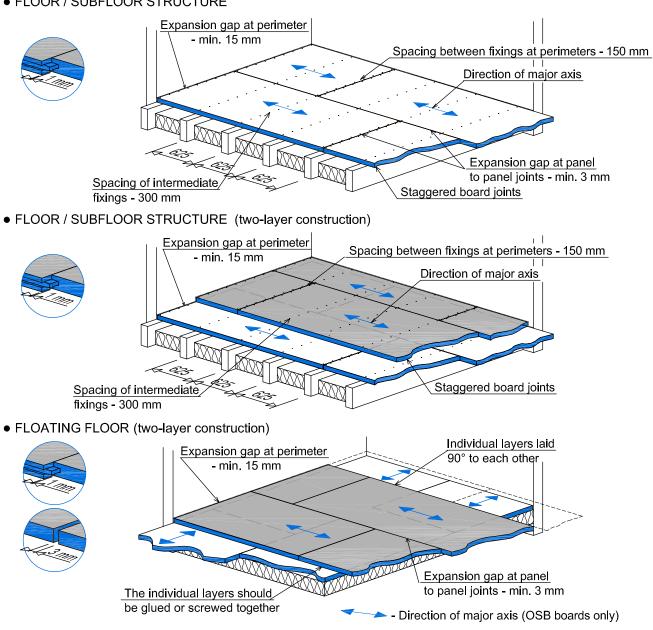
The tongued and grooved structural decking laid across the joists with short edged supported joists
